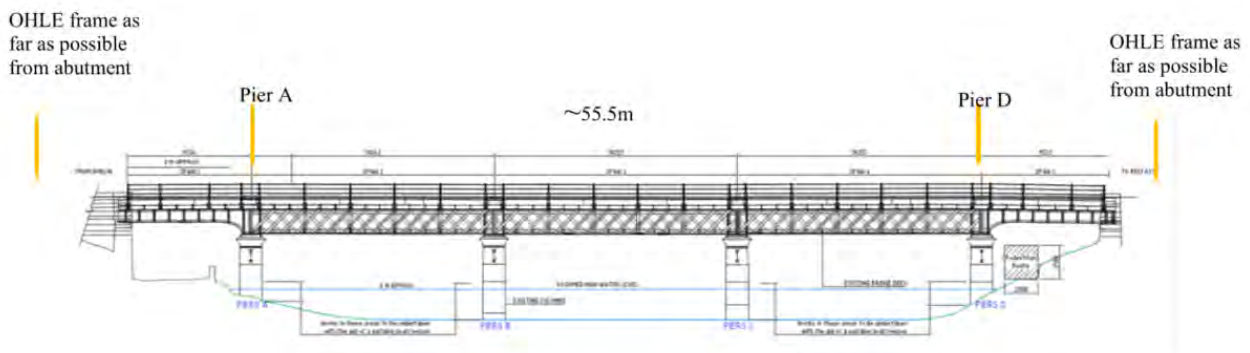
Longitudinal profile of Laytown Viaduct with proposed gantry installation locations
